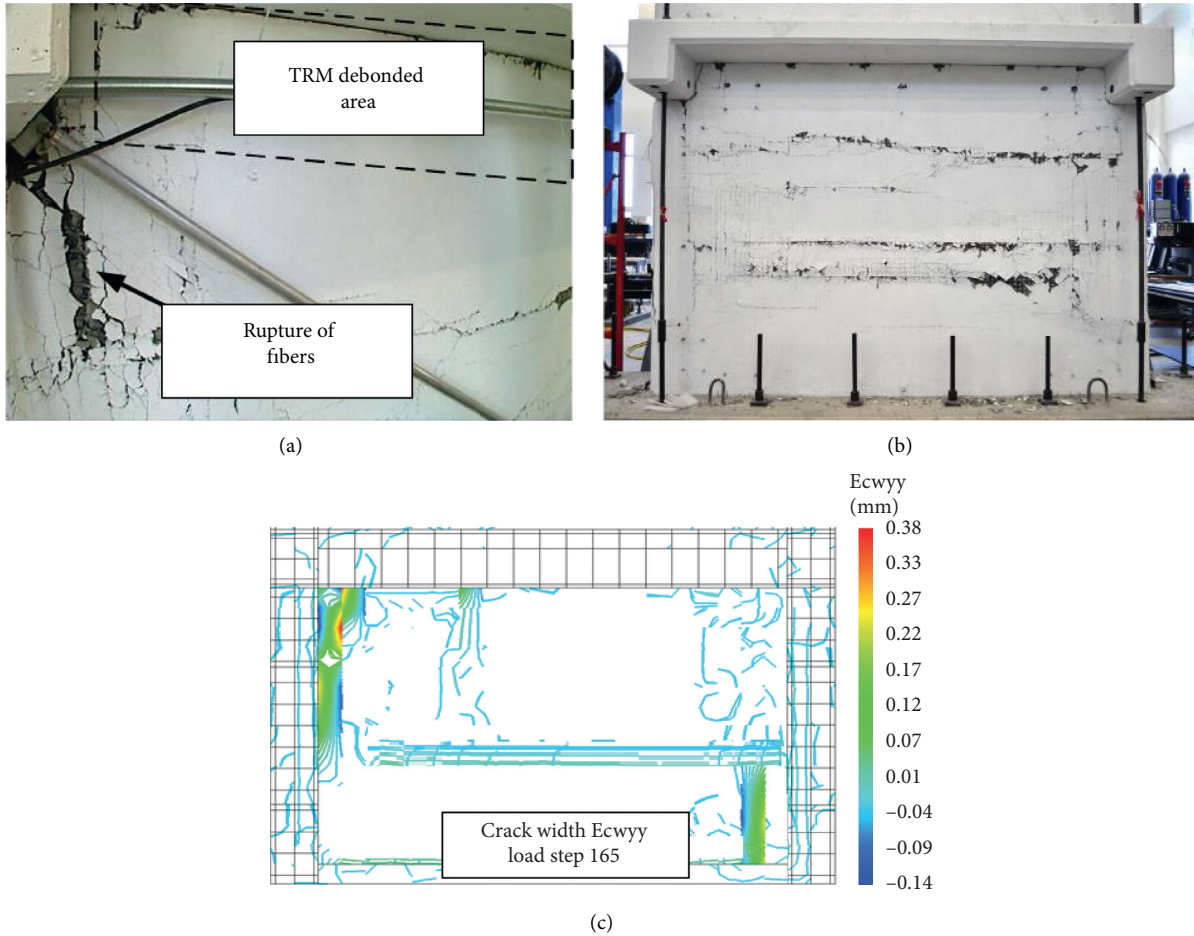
(a) Damage at the first storey on the east column in the experimental study, (b) cracking of the masonry at the first storey in the experimental study, and (c) crack patterns in the numerical model in the masonry infill in the first floor at the end of the test.
